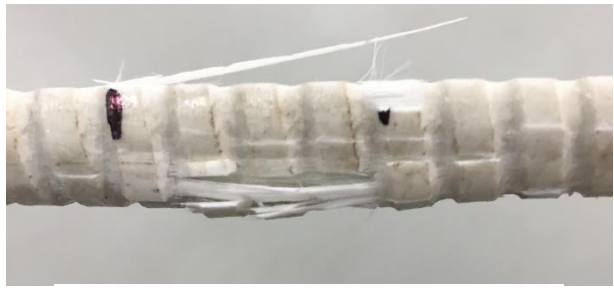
Close-up View of Side Face of M20 Specimen Subjected to 4-Point Bending
